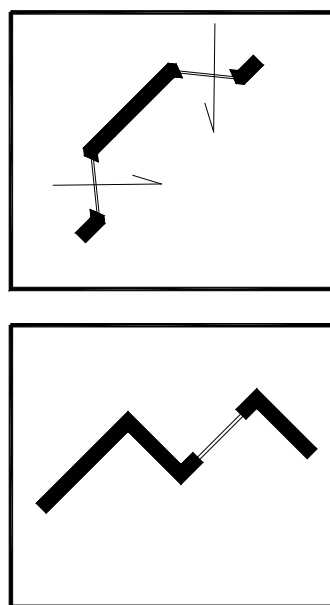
Illustration of a method to offset windows to avoid potential privacy conflict.
